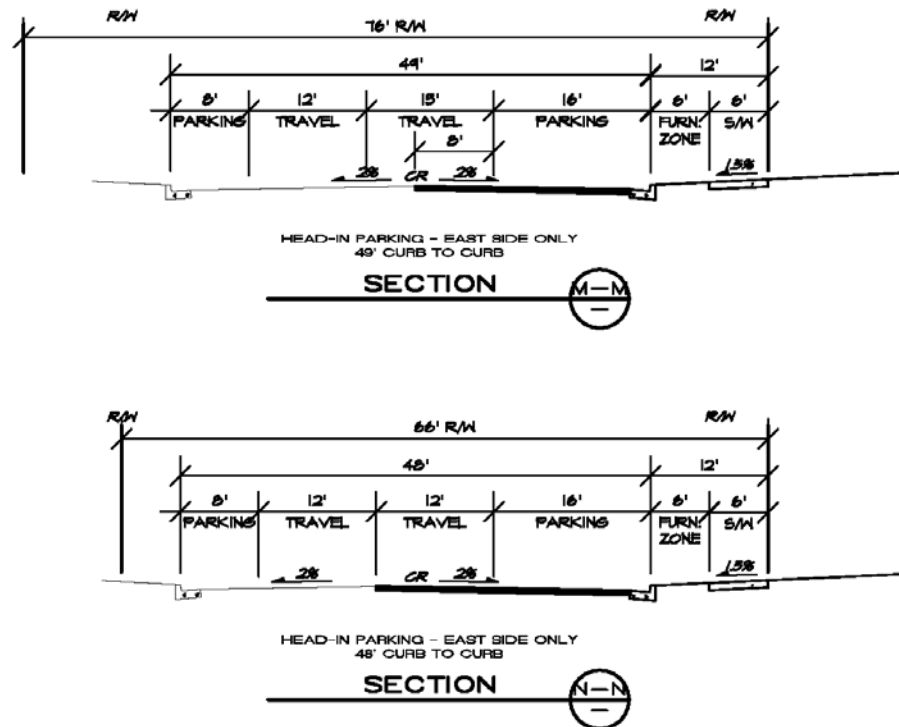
Typical Street Cross Sections M-Blub-outs
